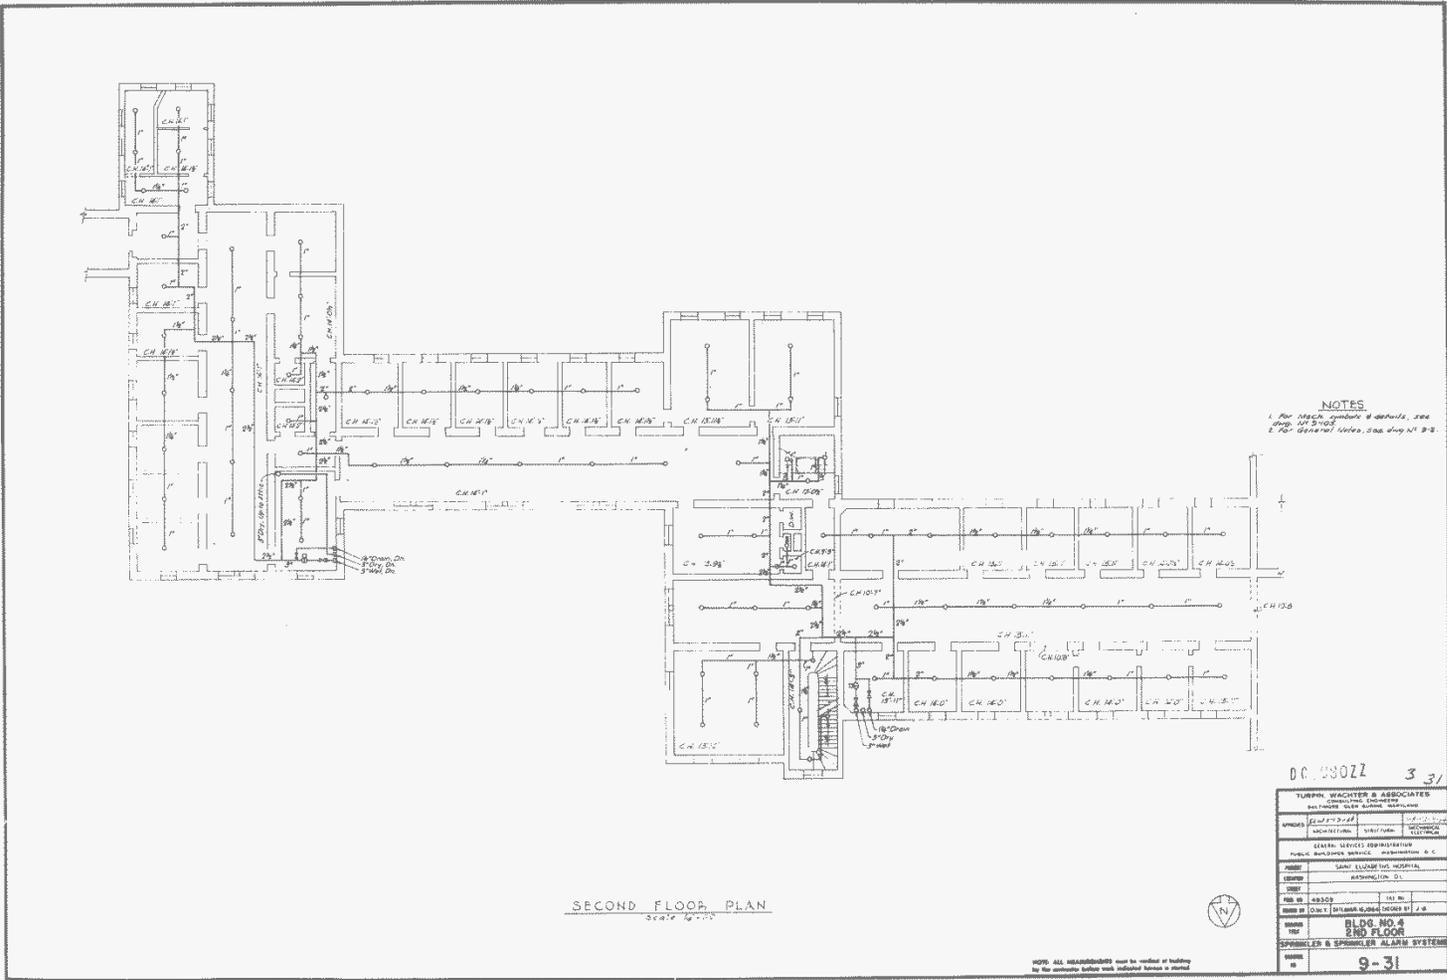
Second floor plan of the East Wing outlining fire suppression system improvements, 1964. Source: GSA archives, image DC0080SE0003.
